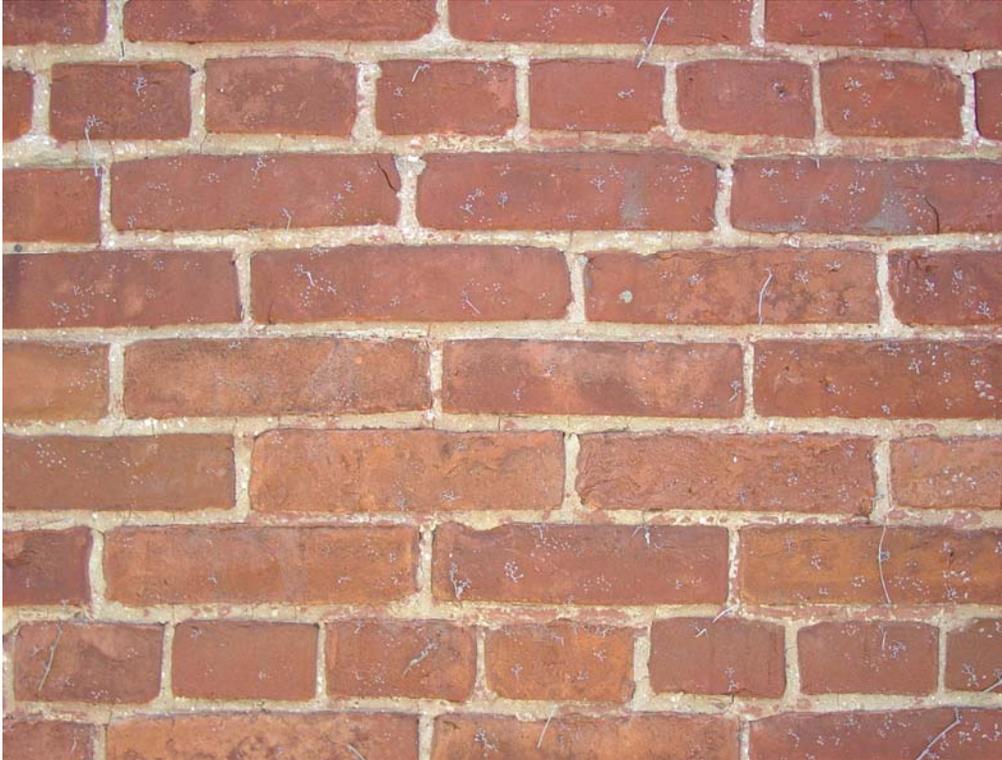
Detail of the exterior brick wall at the north elevation showing common bond pattern—one row of headers to five rows of stretchers. June 2007.
